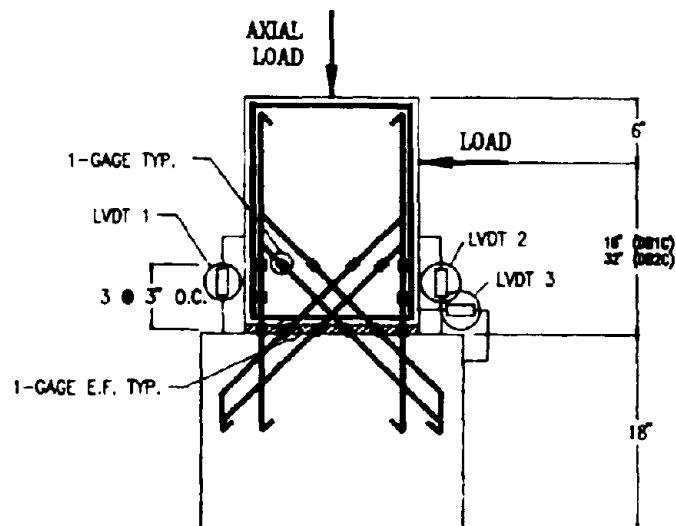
Specimens DB1C and DB2C Instrumentation Details.
